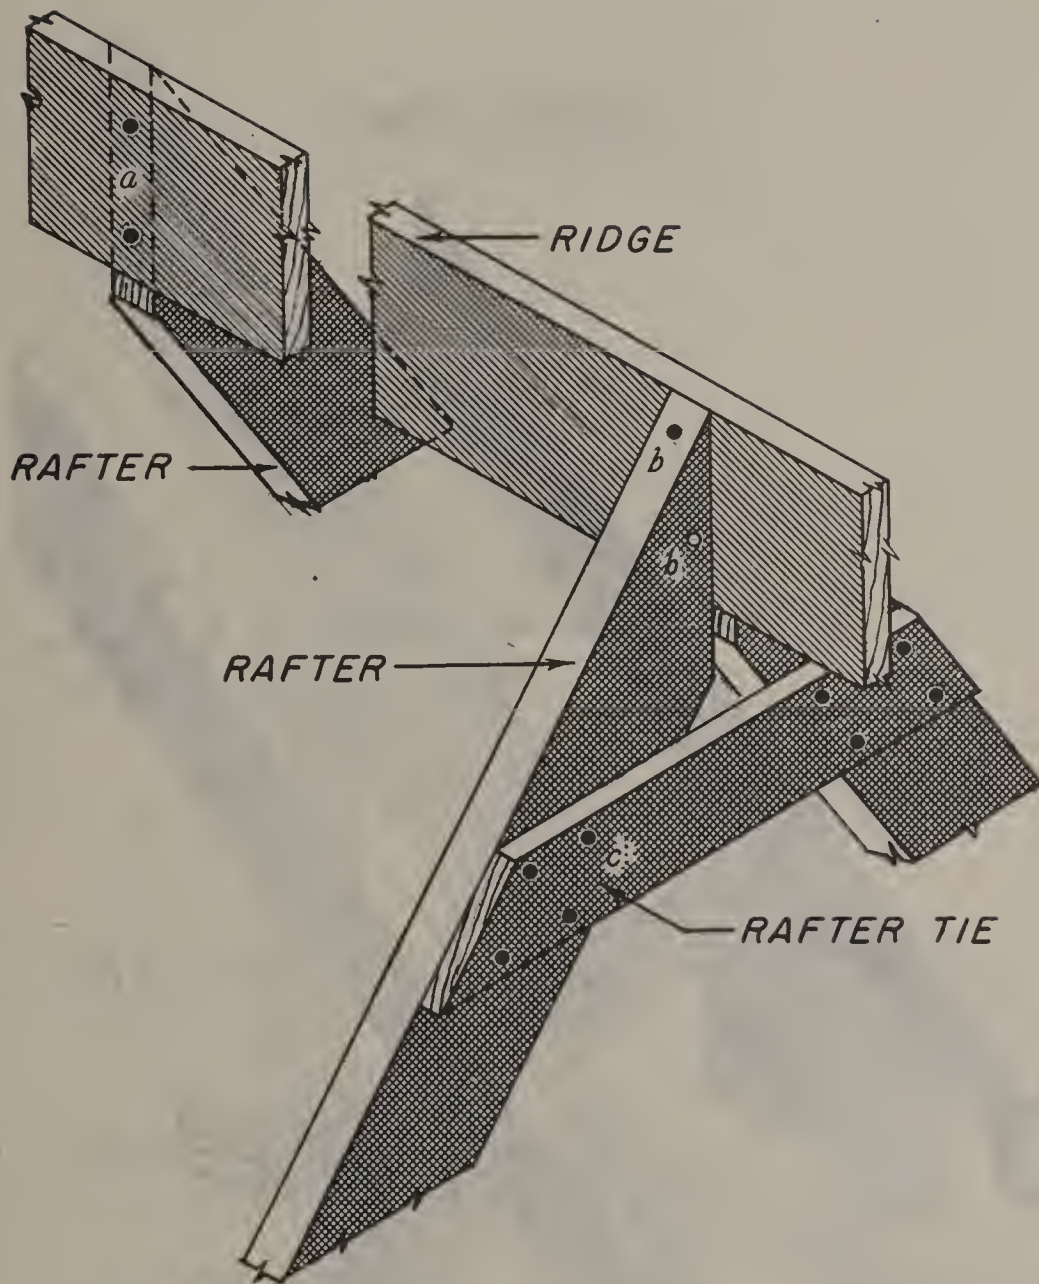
Roof peak. *a*. Ridge nailed to first rafter of pair with two nails (tenpenny for 1-inch ridge or sixteenpenny for 2-inch ridge). *b*. Second rafter of pair nailed through its top edge to ridge with one tenpenny nail and toenailed to ridge with one tenpenny nail. *c*. Rafter tie or collar beam placed near peak and nailed to each rafter with four tenpenny nails. Such a rafter tie is desirable to resist the spreading tendency resulting from wind action, whether or not a ridge is used.
